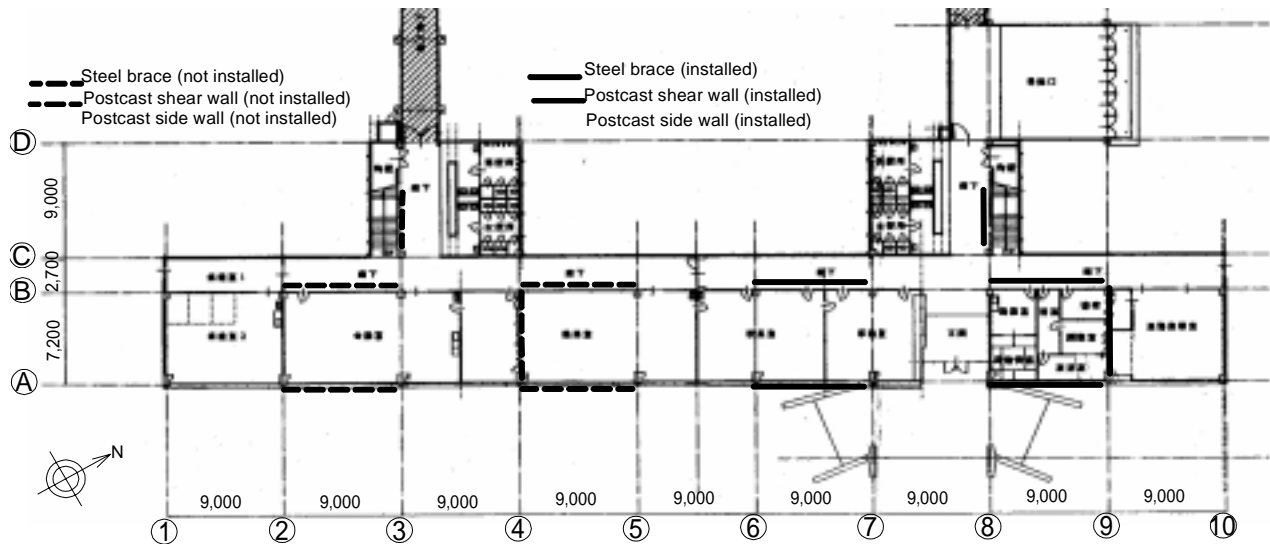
Plan of 1st floor (TS-1 building of TS-High school)
